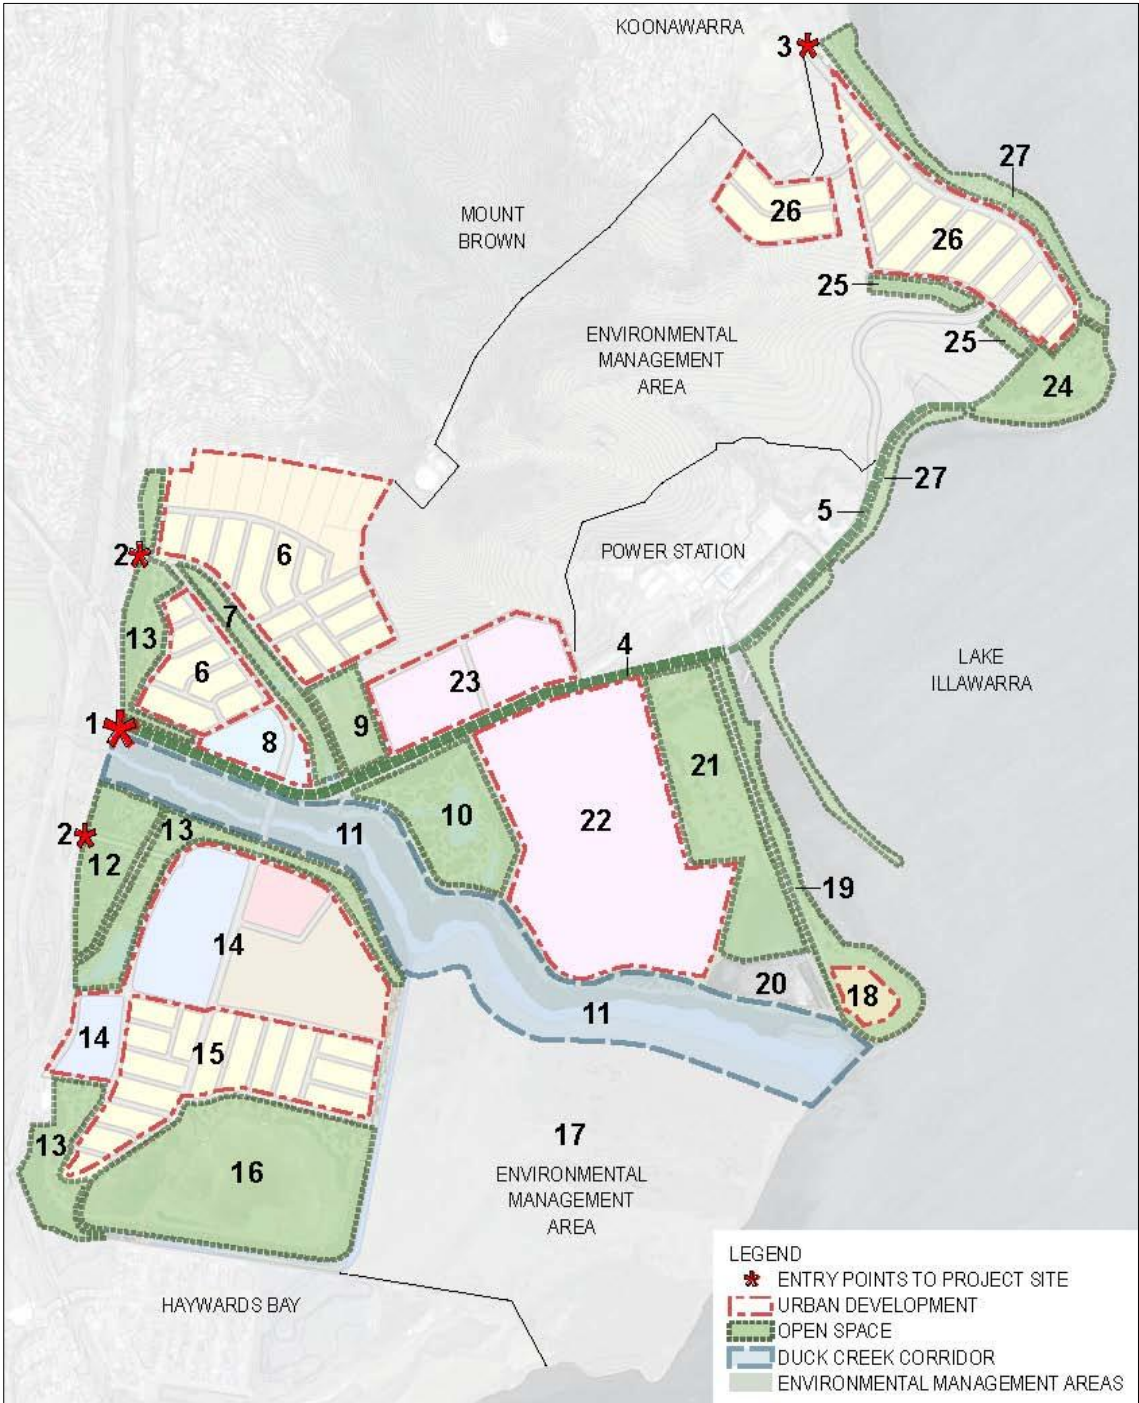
LANDSCAPE PLAN SUMMARY
